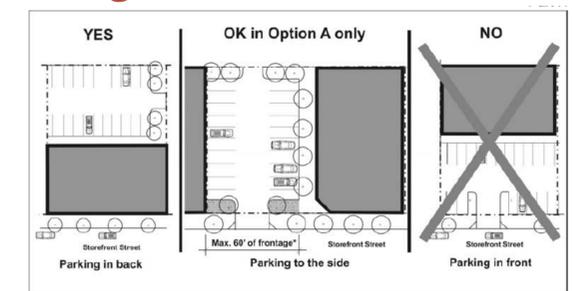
(3)(c). Parking lot location standards for Storefront Street block frontages. Note that the walkway to the side of the parking area is not included in the calculation for the parking area.
